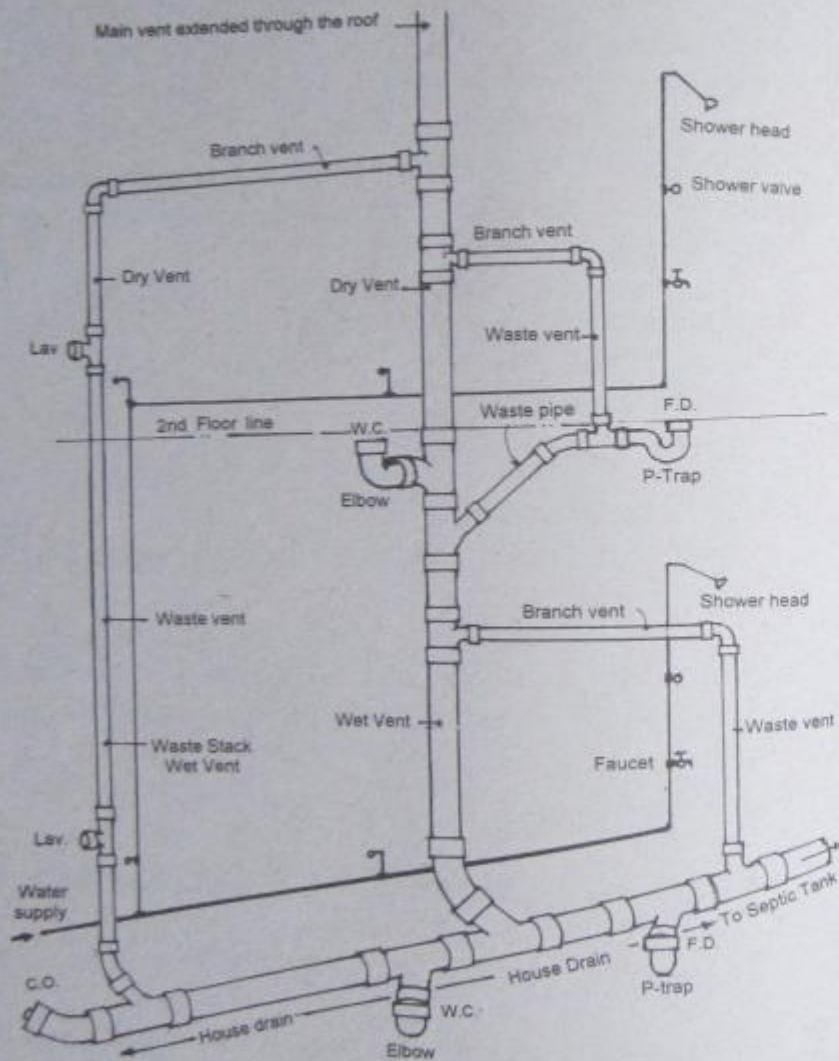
TWO STOREY SINGLE UNIT TOILET AND BATH
